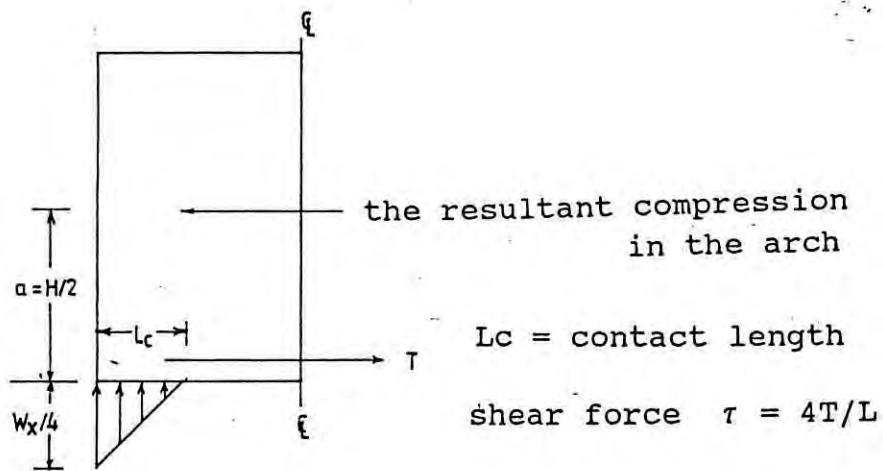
Approximate Force action in a wall beam (Green)⁽¹⁸⁾
